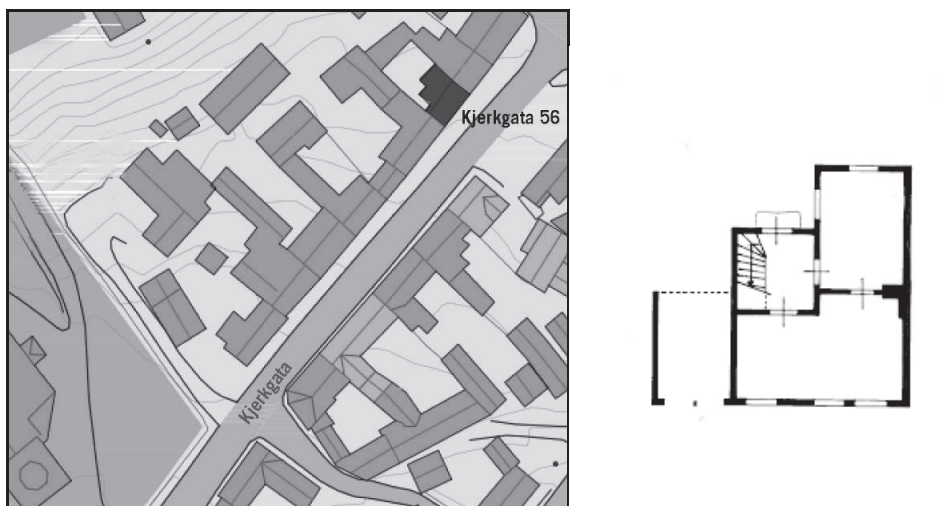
Kjerkgata 56 site plan (left) and floor plan (right), (August Schmidt 2010)
